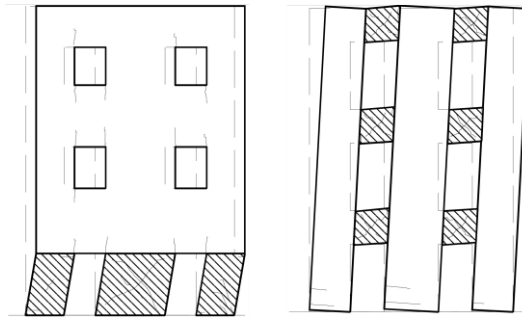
Examples of in-plane failure mechanisms of masonry walls [3]
